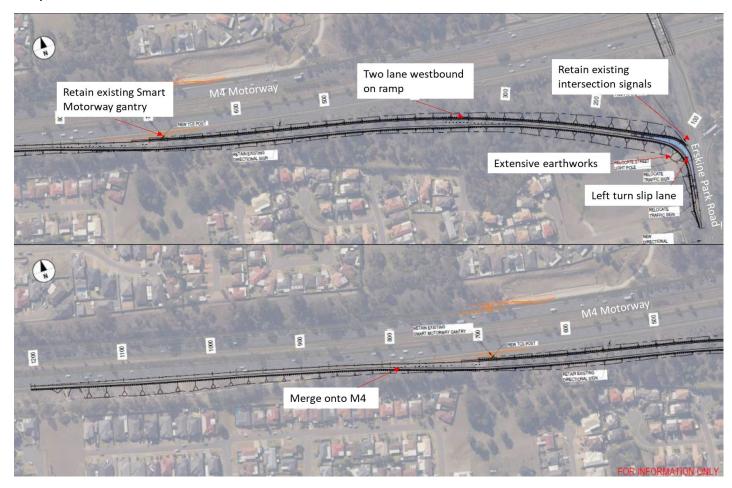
Option 3 Layout: Construct a two lane, directly west-facing on-ramp from Erskine Park Road to the M4 westbound mainline only for traffic travelling north on Erskine Park Road, St Clair
